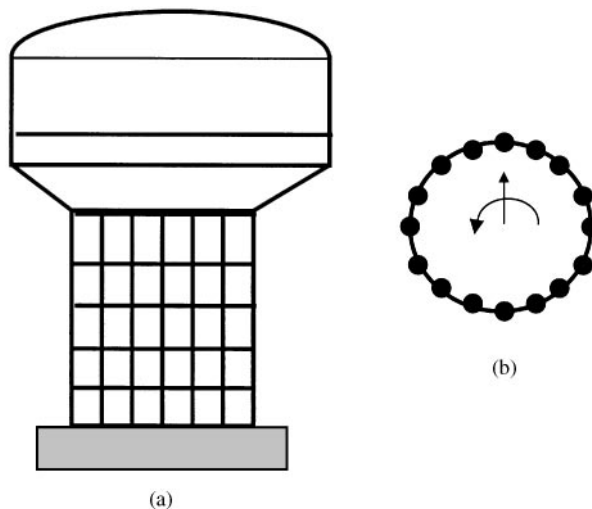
Two-degree-of-freedom idealization of an elevated water tank on frame staging. (a) Elevation, (b) Staging plan
